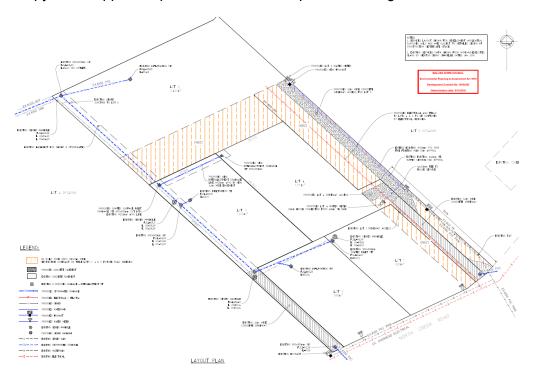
Approved plan of subdivision DA 2018/452 (the key elements to note are the overall lot configuration (five lots) and the no build zone which is shown hatched)
